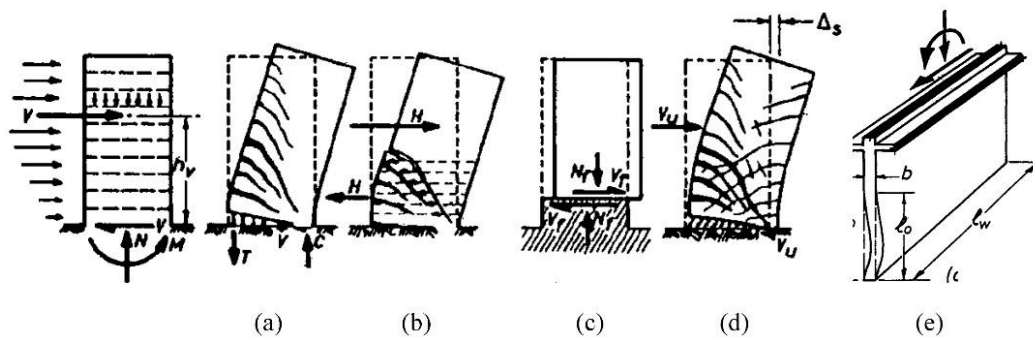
Failure modes in cantilever walls [26,27] ; (a) flexural yielding, (b) diagonal tension, (c) sliding shear, (d) hinge sliding and (e) lateral instability.
